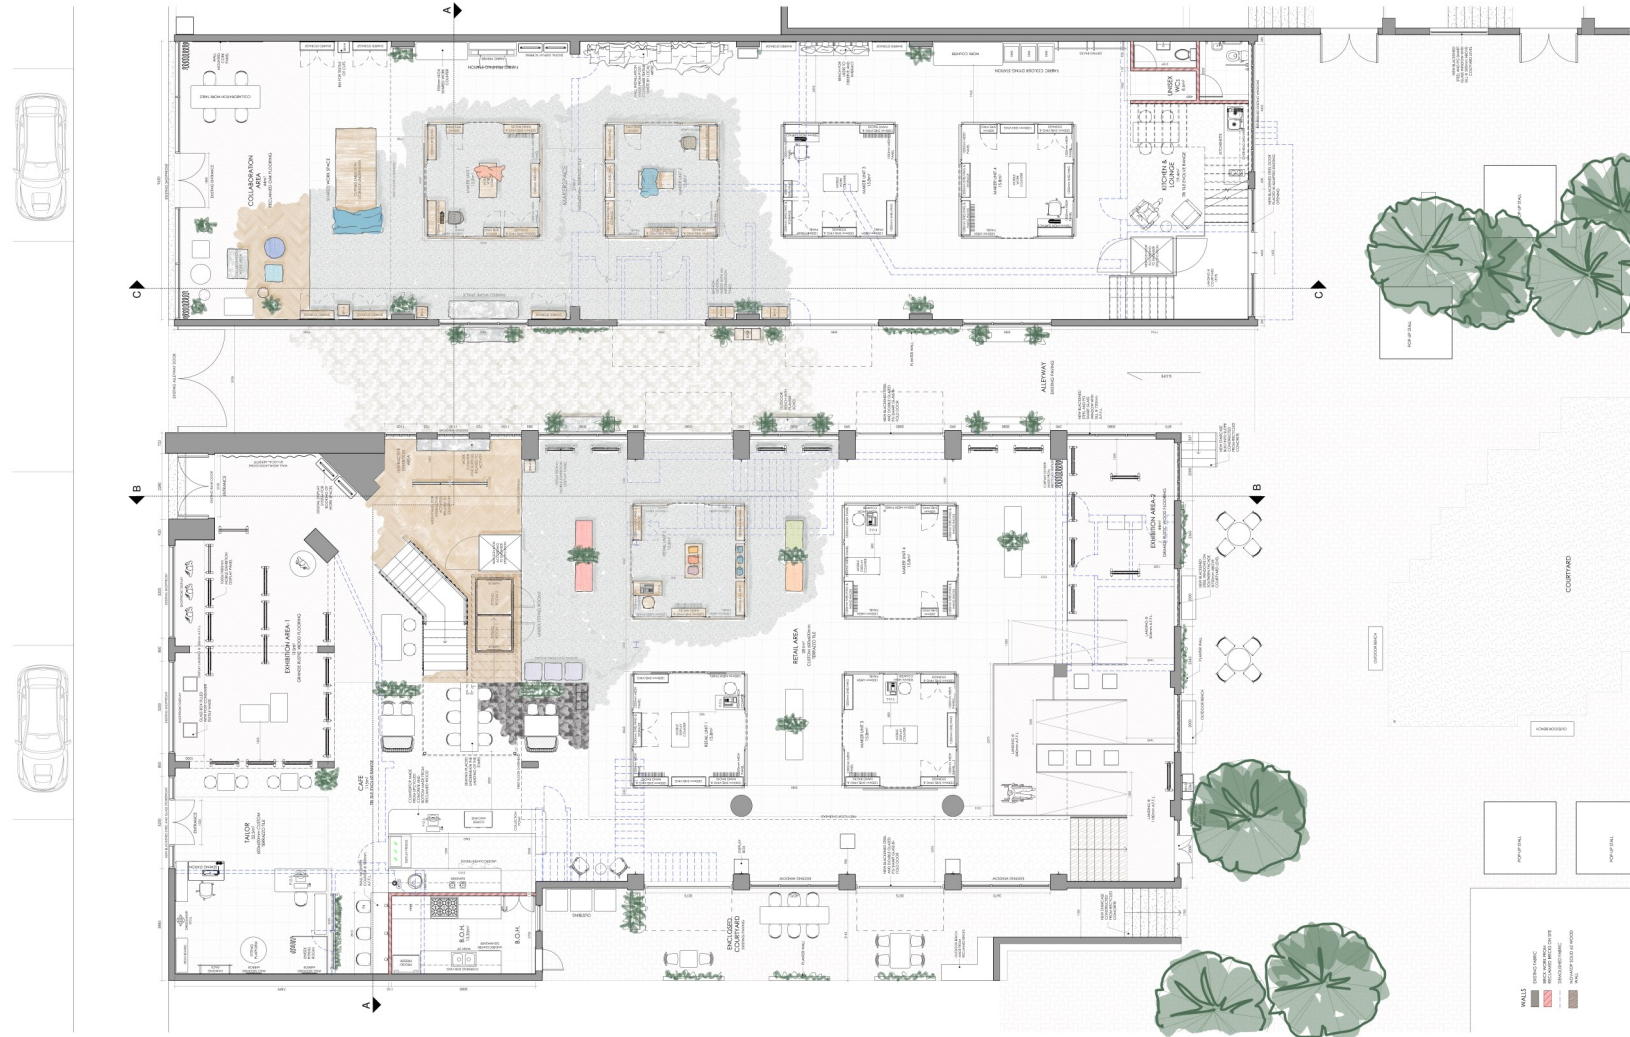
Design focus ground floor plan, not to scale (Author, 2020)
